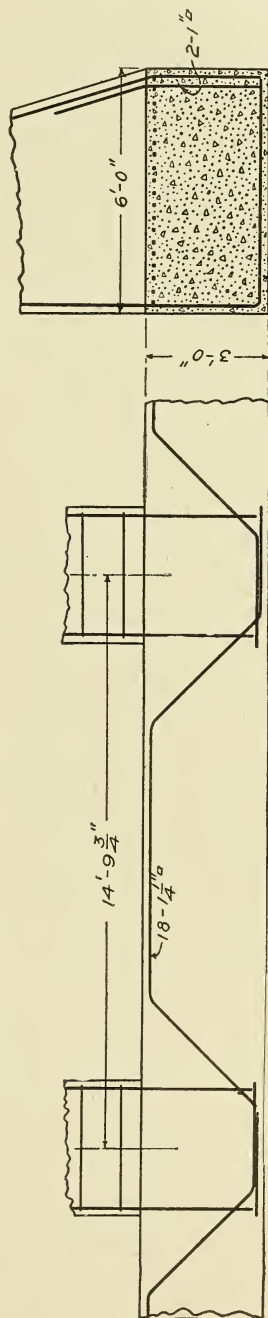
Details of Continuous Footing, Mershon Building, Philadelphia, Pa.
